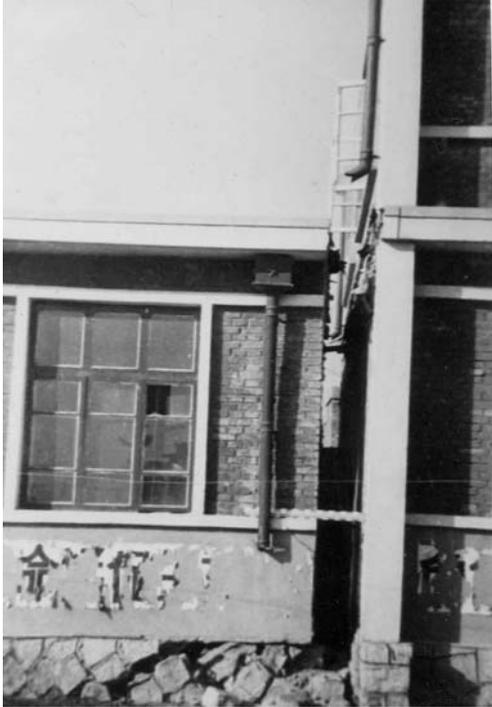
The Beitang shiplock office building was separated by the earthquake.
